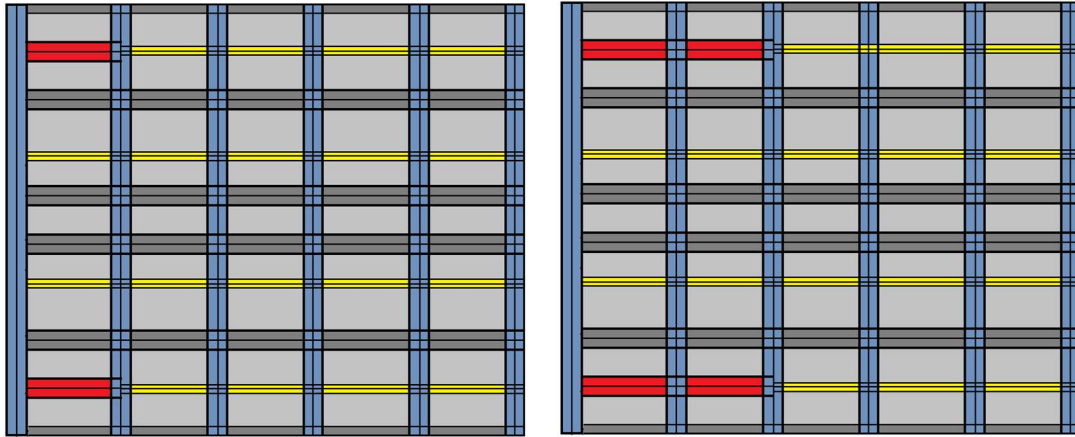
Flap girders (red) replaces longitudinal girders and stiffeners
